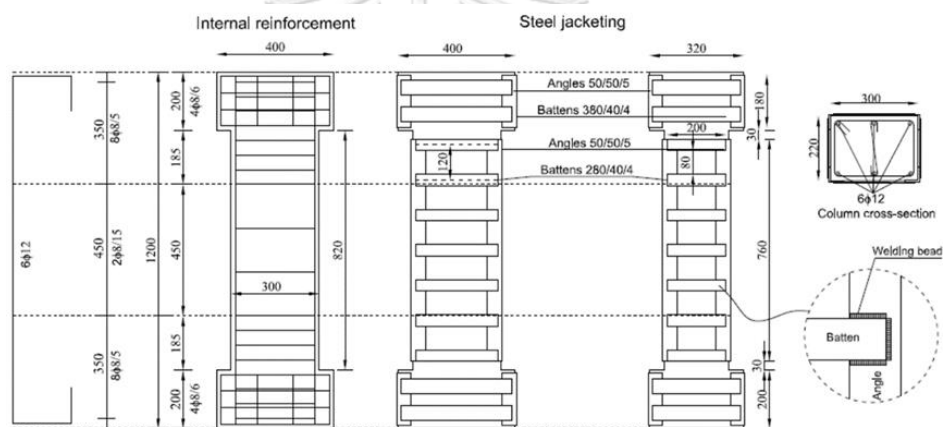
Design detail of specimens with and without steel jacketing [35]
